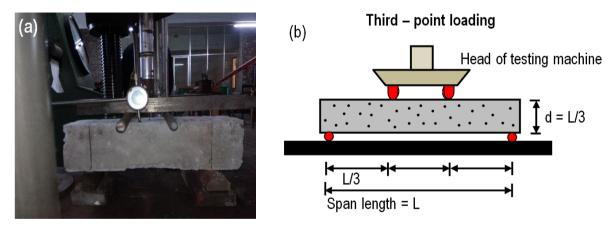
Flexure Test of Concrete by third-point loading method; (a) Photograph of test setup, (b) Schemetic view of test setup.
